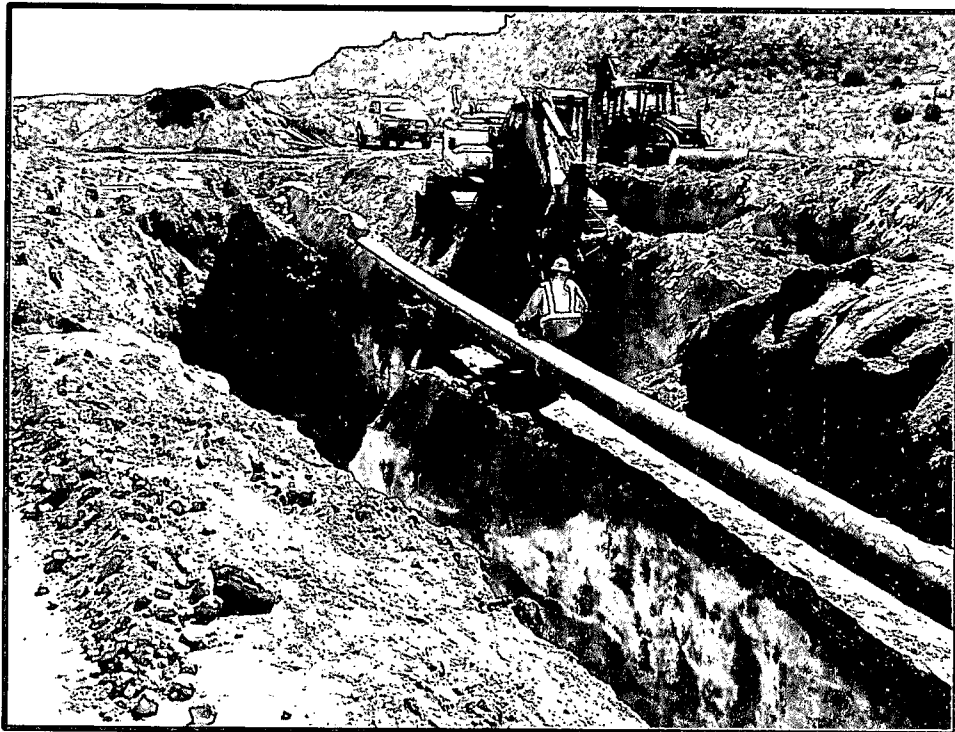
Phase 2 of the overall excavation of the Trunk K #2 pipeline release.
